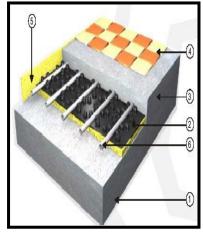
Detail of Watered Uderfloor Heating System (http://www.hpwarehouse.co .uk)
